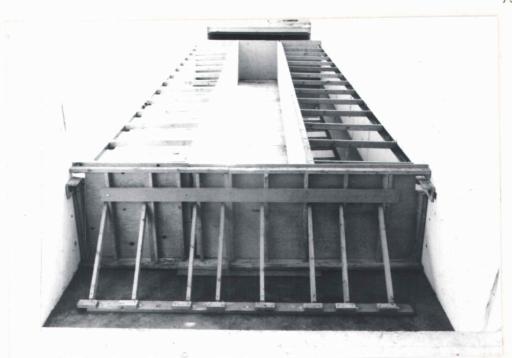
In place photograph of the test section before the addition of the soil layers.
